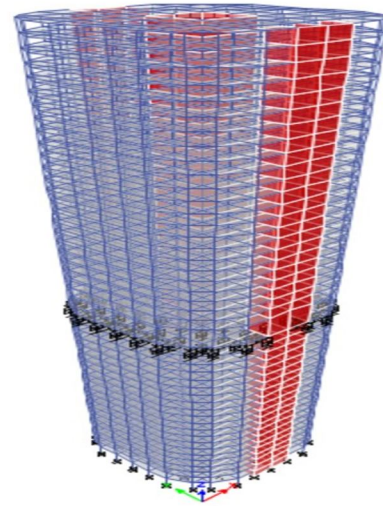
Soft Storey at 22nd floor (storey 22) with LRB
